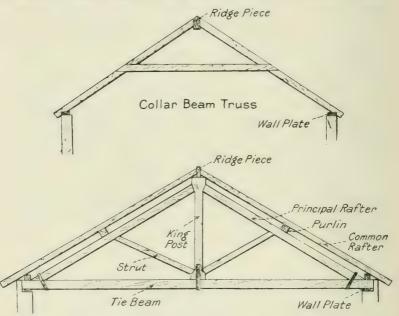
COLLAR BEAM AND KING POST TRUSSES. SCALE 1 inch = 1 foot.
